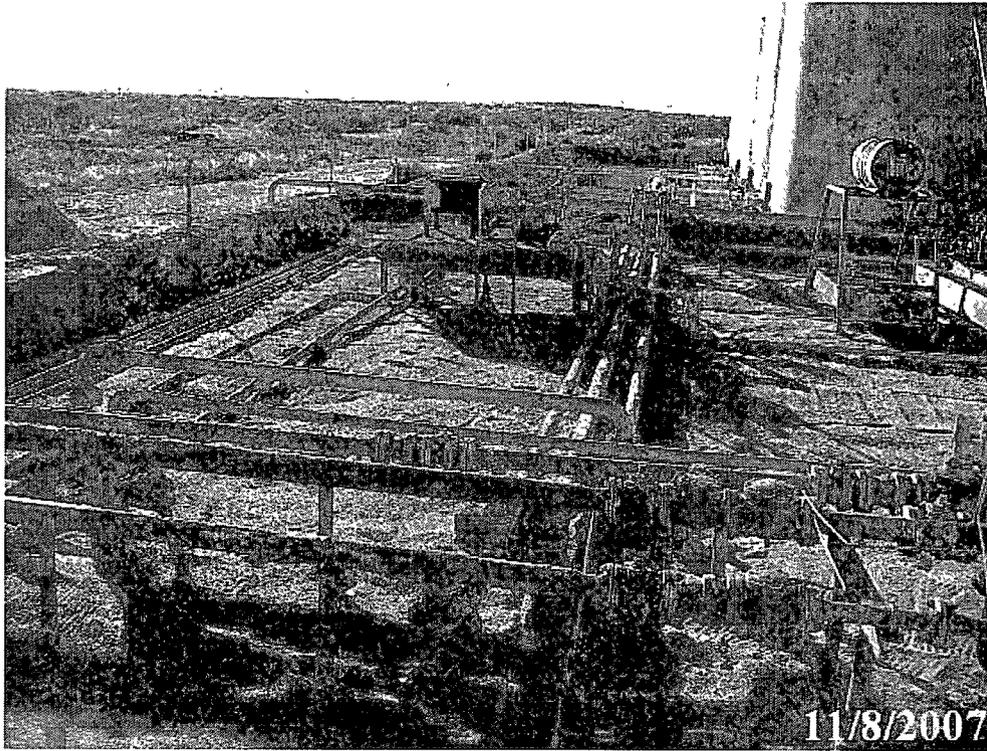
Excavation area showing piping, horizontal separator and earthen supports
